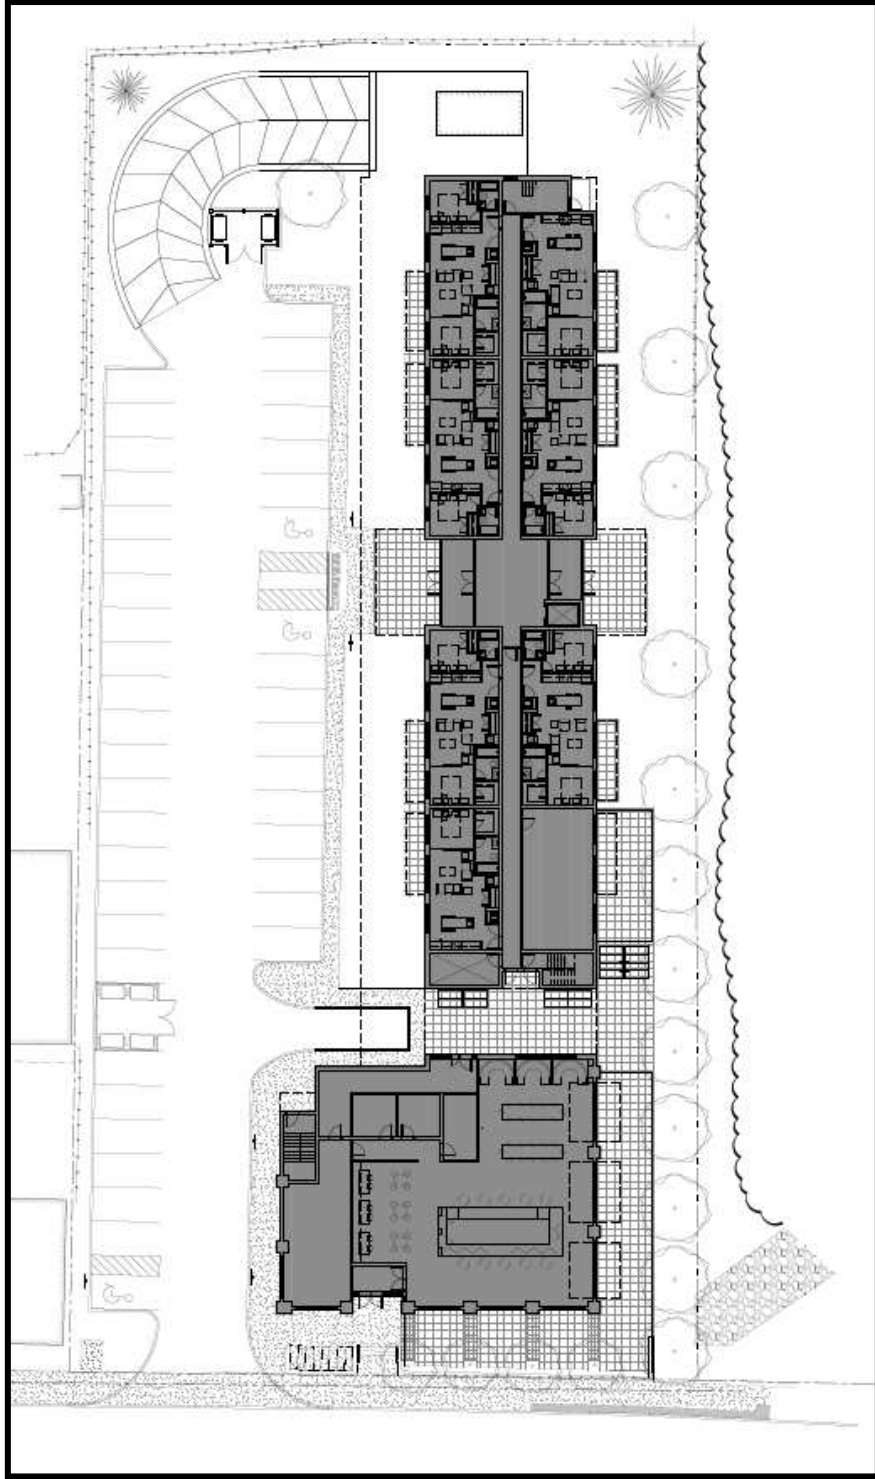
Ground floor plan. Source: Vandenberg & Wildeboer Architects, Nov. 2020.
